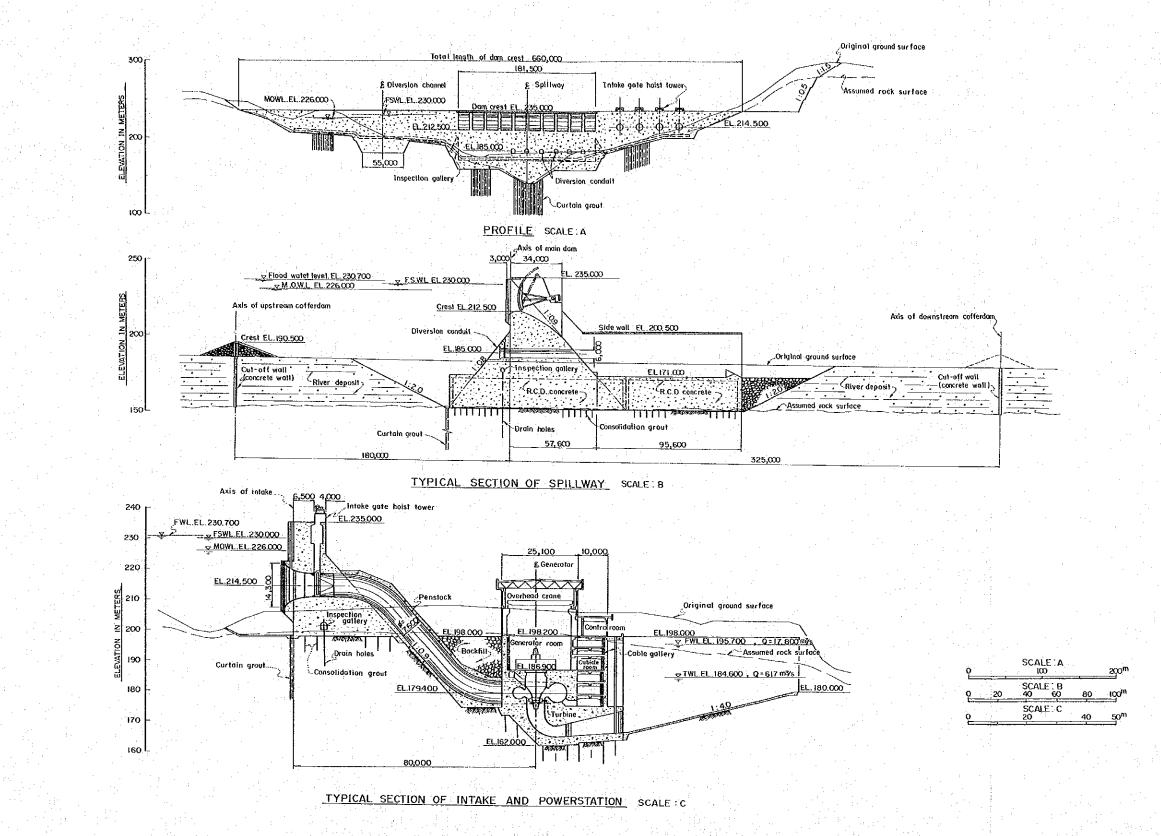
SECTION AND PROFILE(SCHEME: GRAVITY DAM, DAMSITE-B, F.S.L 230, 225MW INSTALLED CAPACITY)
